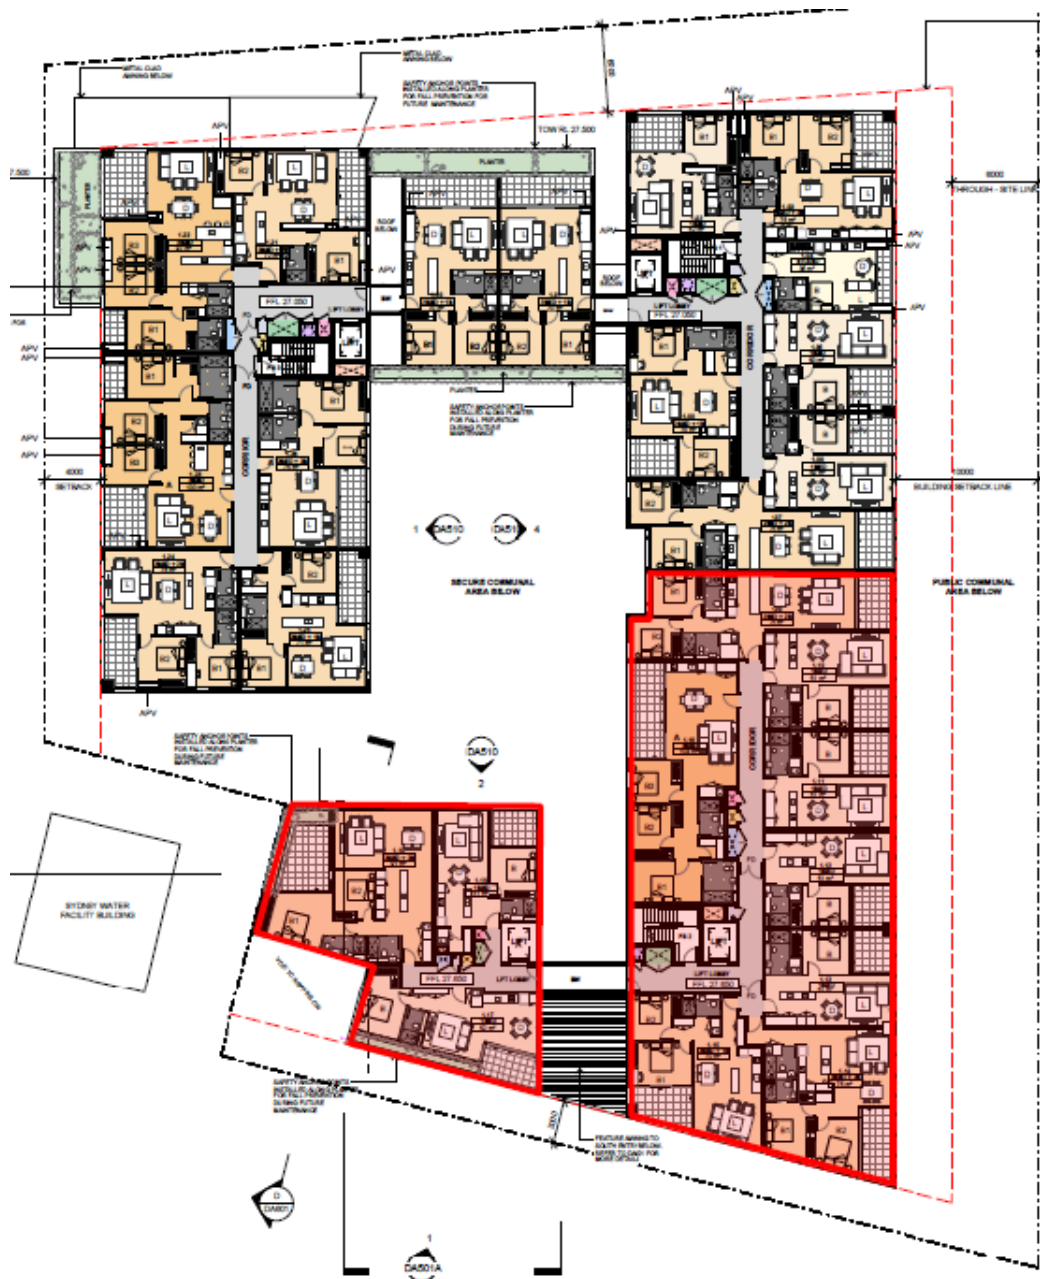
Level 1 where non compliant 2.7m floor to ceiling height is proposed.
